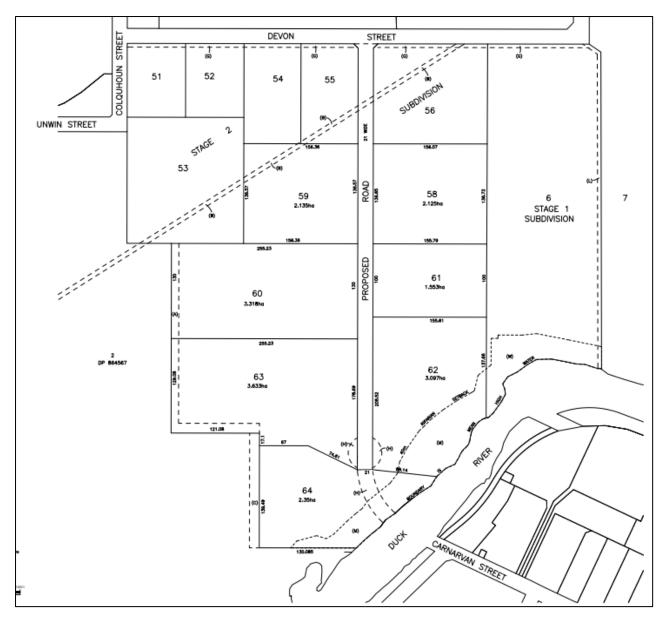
Location of Lot 6 (Stage 1) within the final proposed subdivision plan (from: Element Environment, 2020b).
